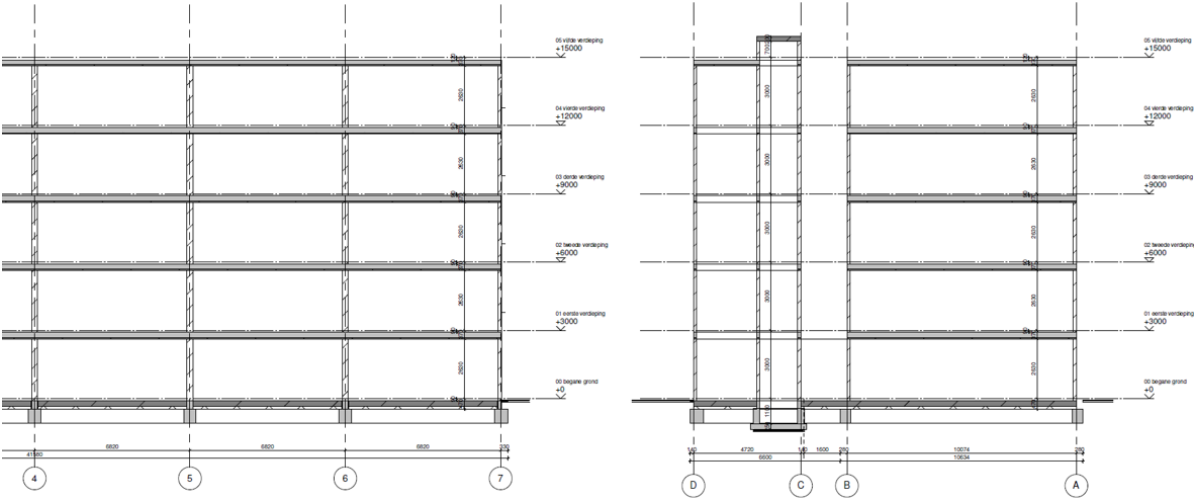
Longitudinal vertical section of the main building (left) and transverse vertical section of the main building and entrance building (right) (Venster Architecten, 2024).
